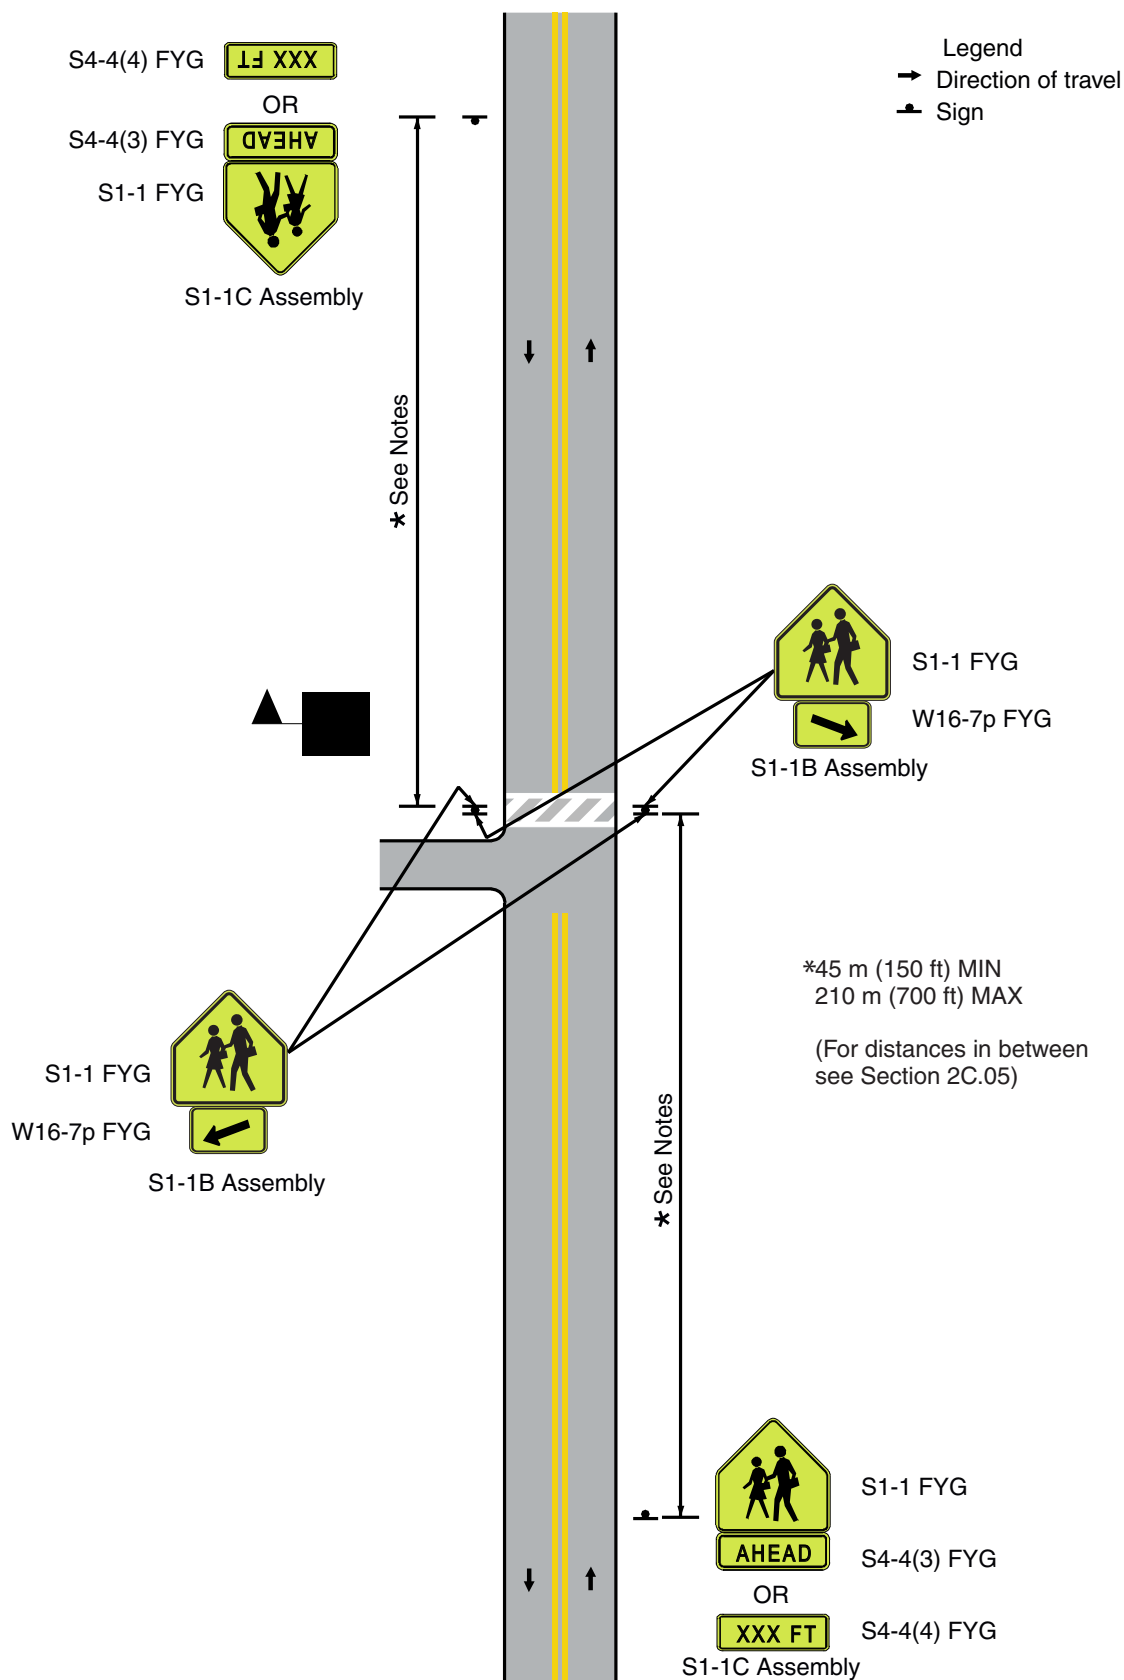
B-2a. Examples of School Crossing Sign (Non-School Zone)
